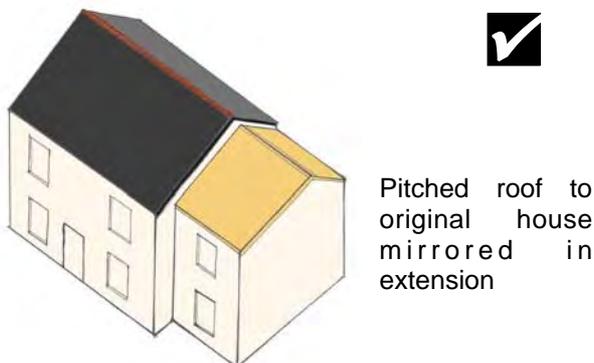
The roof profile of the extension should match the shape and pitch of the original house
